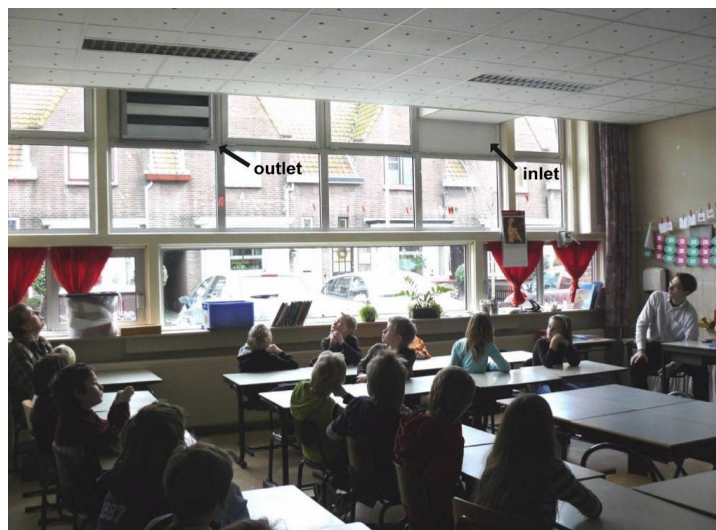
Sliedrecht ground floor, decentral supply and discharge, perforated ceiling.
